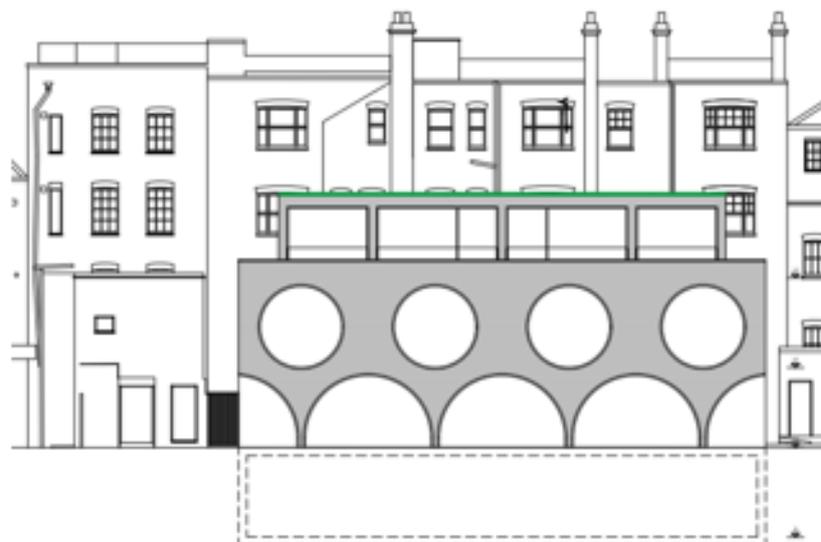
Proposed front elevation from previously refused scheme (Ref. P2020/1707/FUL)
